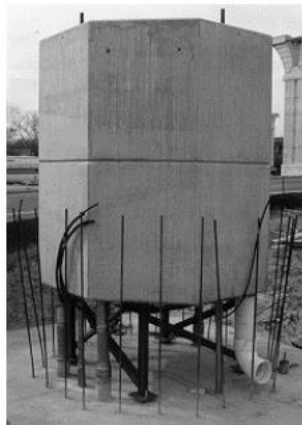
Pier cross-sections proposed by Billington et al. (1998)
